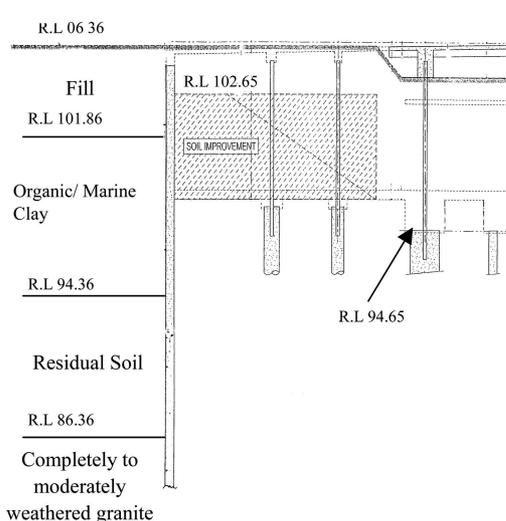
Use of deep soil mixing to provide an improved berm, HDB Centre at Toa Payoh.
